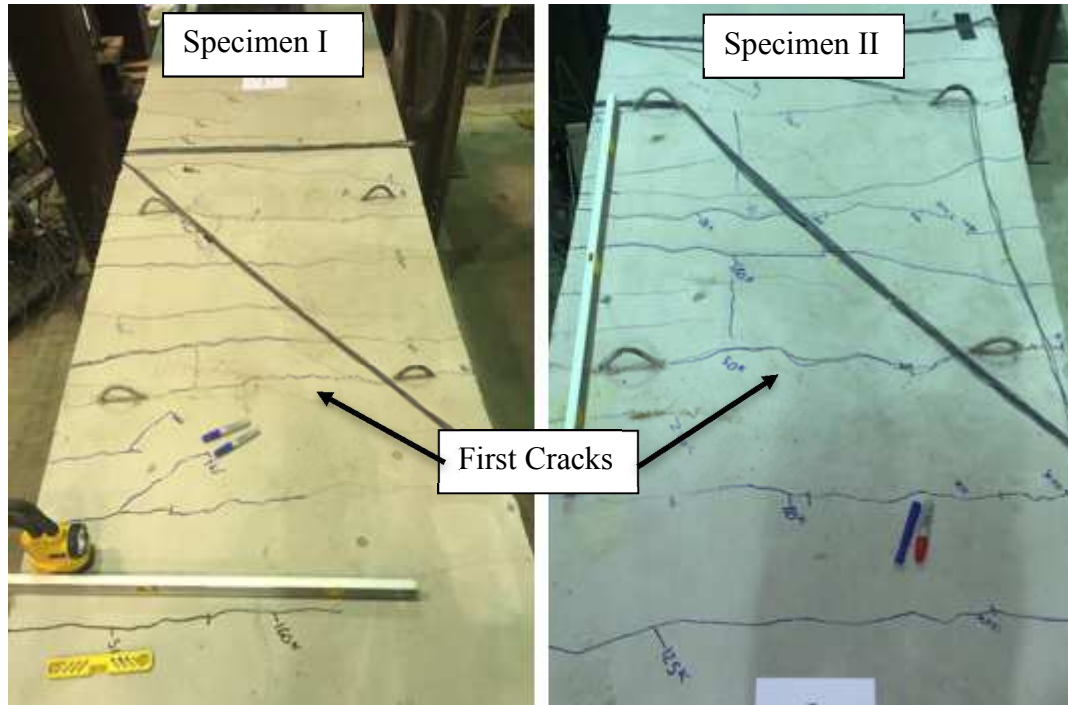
Crack Formations on Deck Slab for Each Specimen
